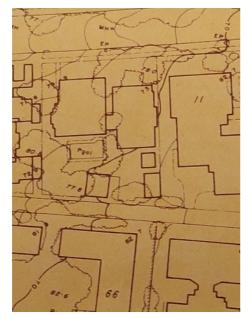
(Left) Water Board plan, 1977 (detail) showing pool addition to 7 Selwyn Street. Sydney Water Archives.
